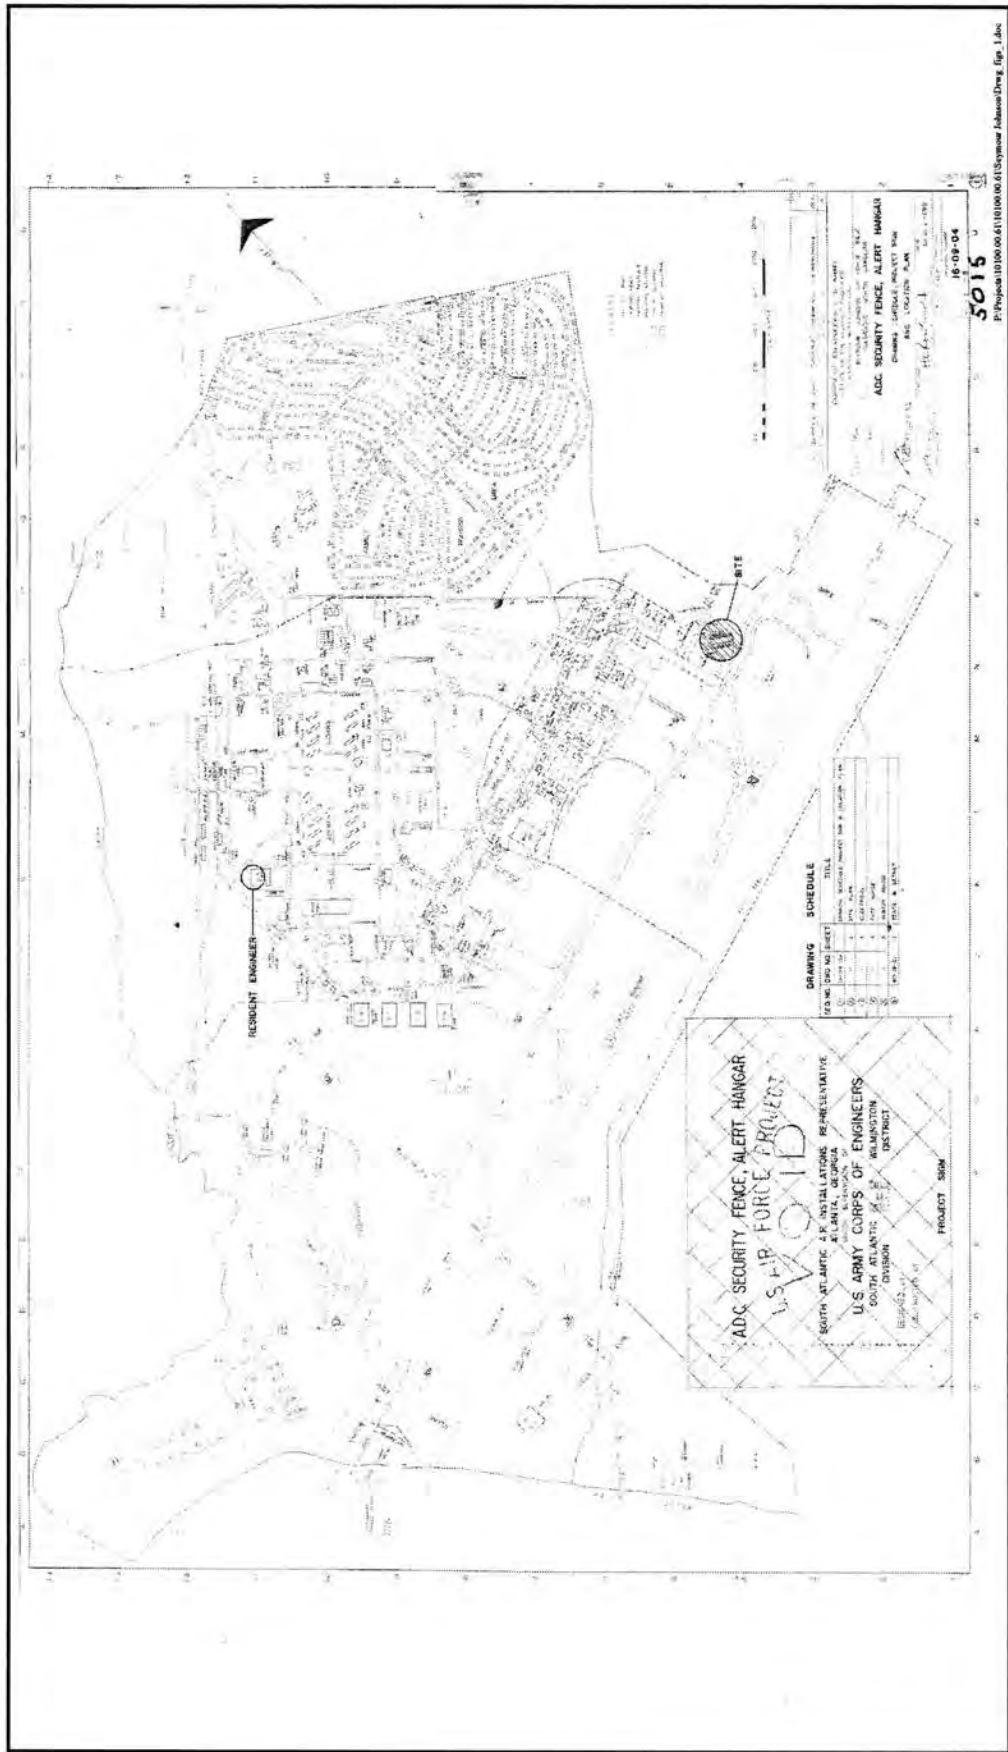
Building 5015—record drawing, A.D.C. security fence, alert hangar drawing schedule, project sign, and location plan, 1959 (Source: Seymour Johnson Air Force Base Civil Engineering Vault)
